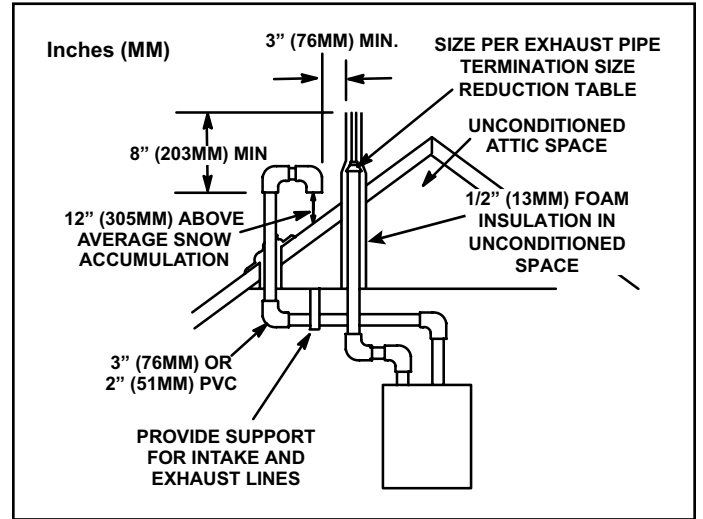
Direct Vent Roof Termination Kit (15F75 or 44J41)
